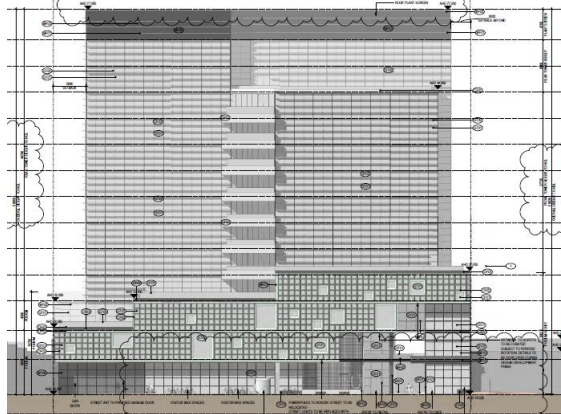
Rokeby Street elevation (West Elevation) of Scheme presented to the PDC on 18 November 2020.
